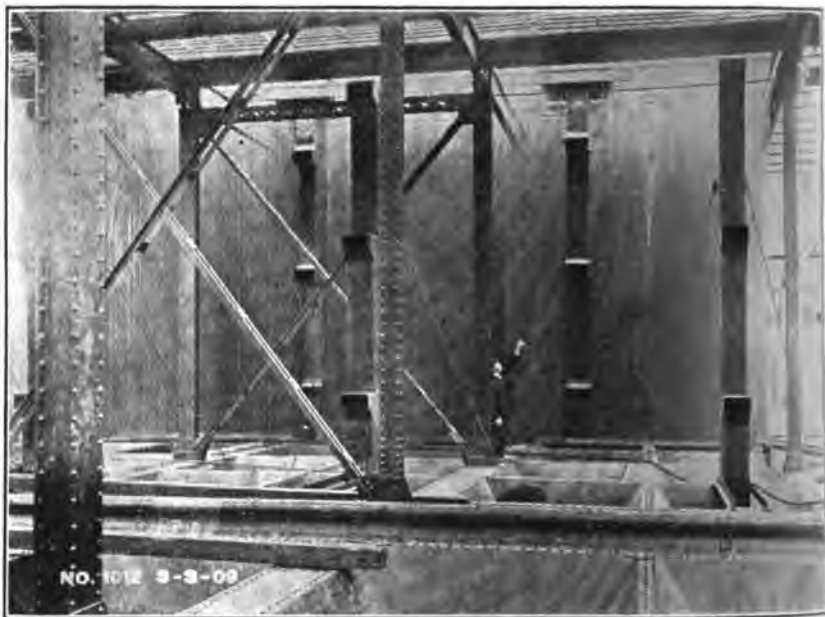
PLATE XXVII.—INTERIOR OF DUST CHAMBER, SHOWING WIRES AND COLD-AIR PIPES
